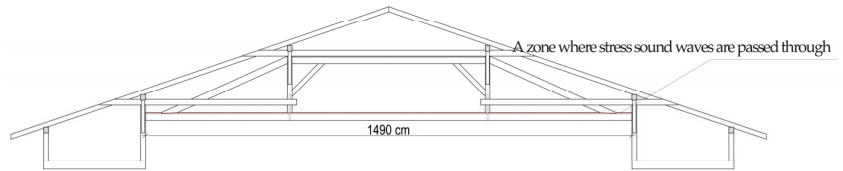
Roof girder, a segment of the roof structure through which the stress-sound wave was passed.
